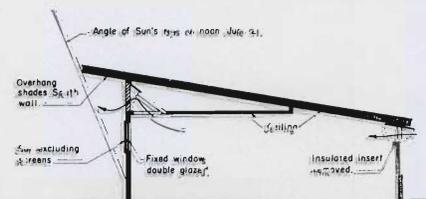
Schematic sketch of the summer air circulation system used in the pole frame hog farrowing house.
